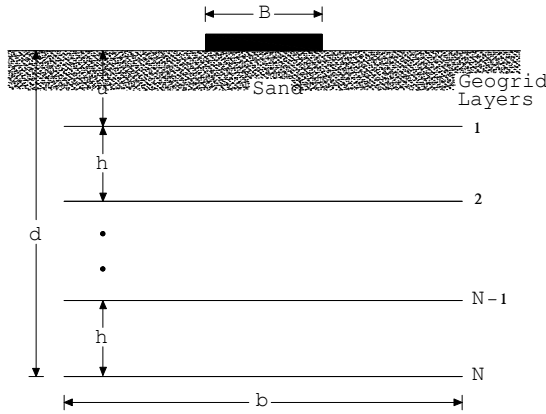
Geometric parameters of one type of reinforced soil foundation.
